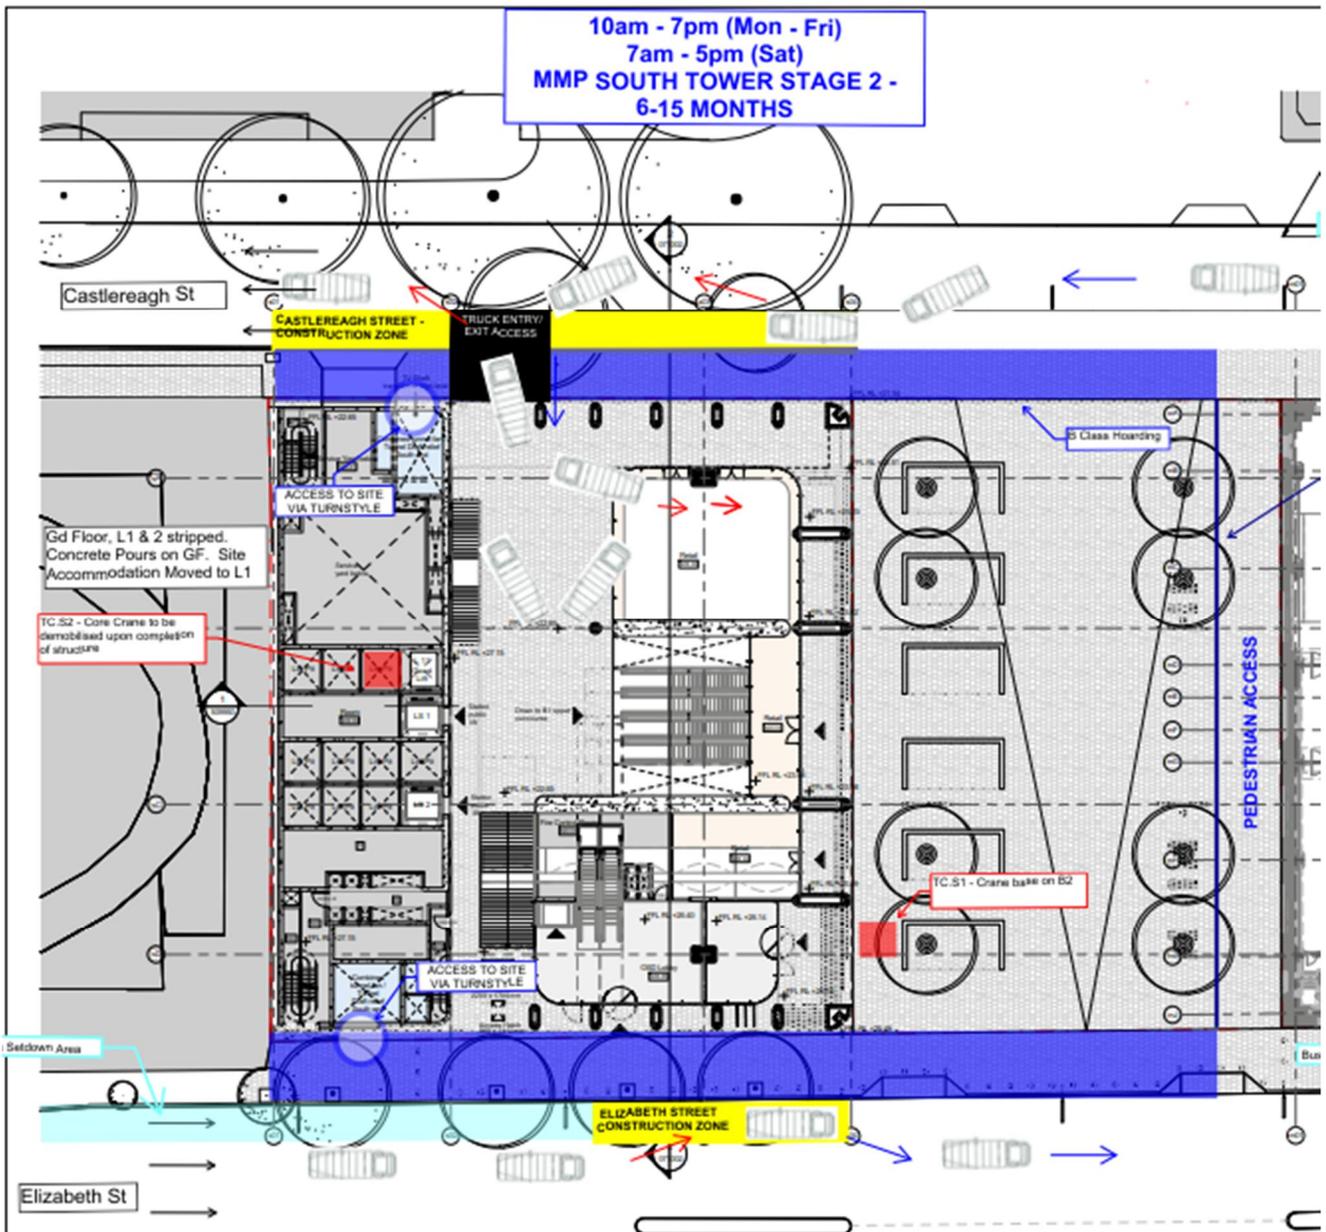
Construction Zoning Stage 2 - 7am - 7pm
